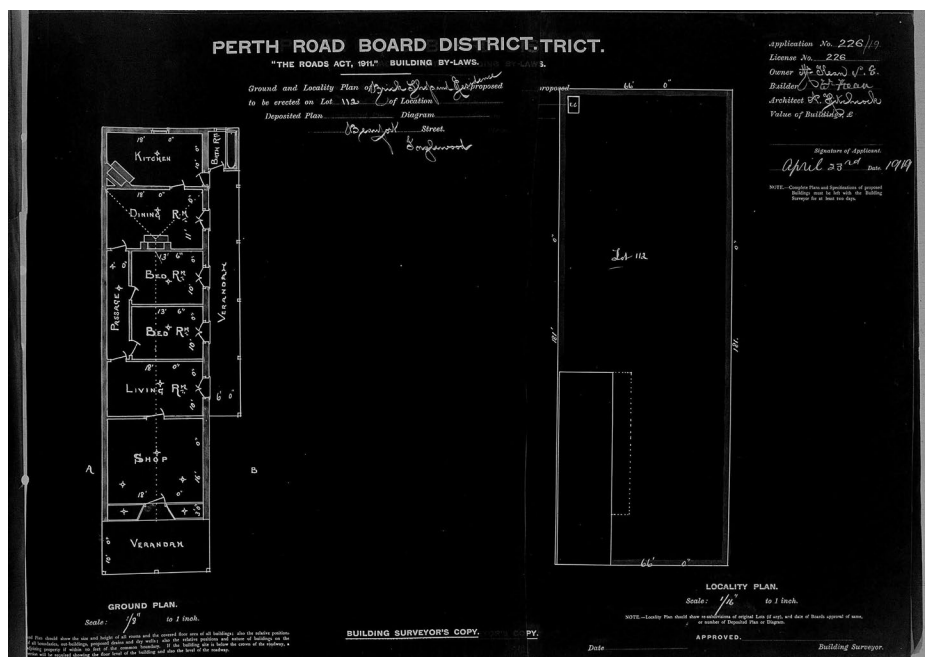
Proposed plans from 1919 for 752 Beaufort Street
